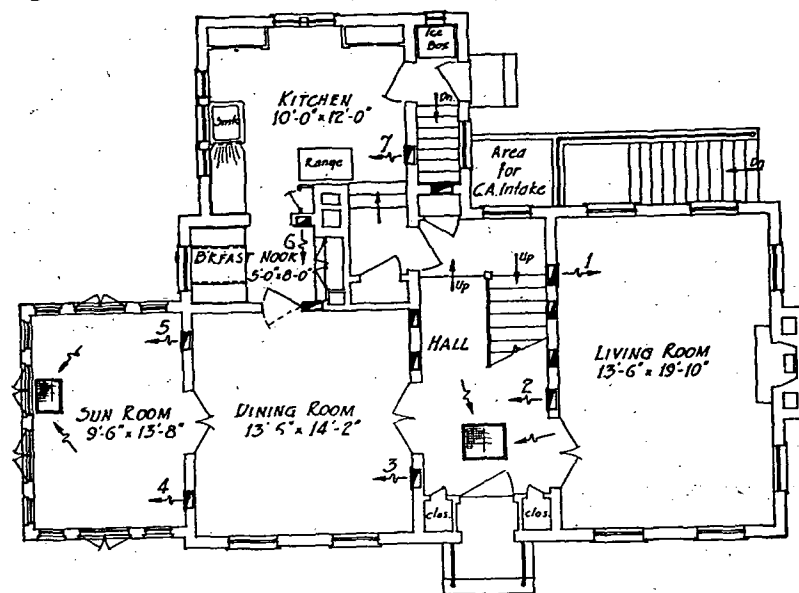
FIRST FLOOR PLAN RESEARCH RESIDENCE
